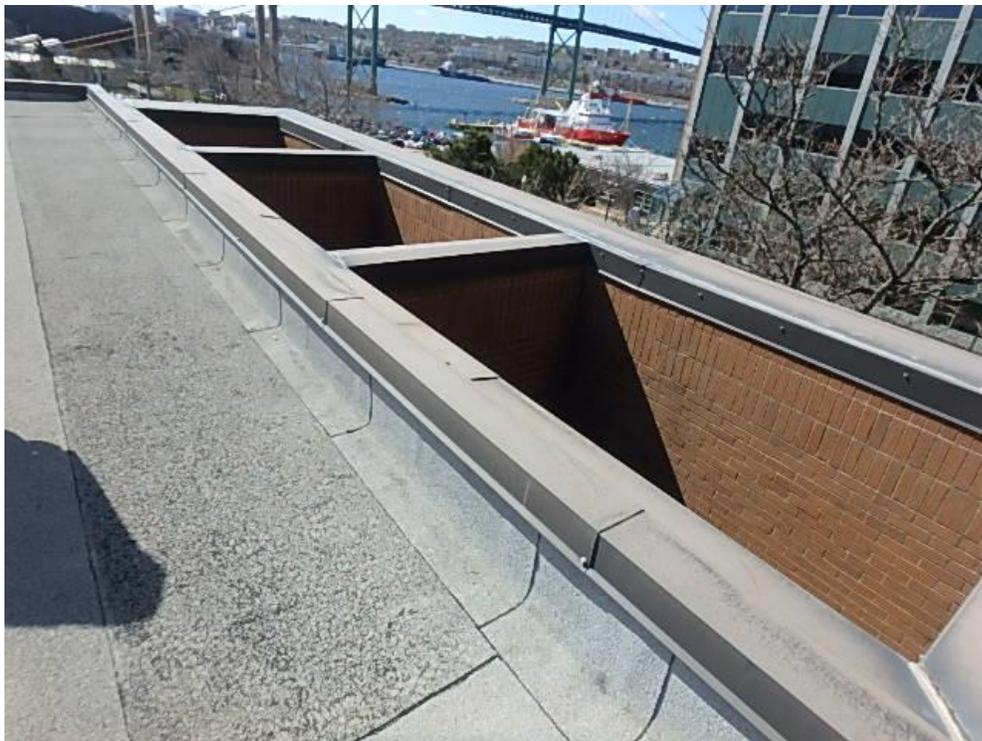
Roof Area 1.1 –.Ridging of membrane at seam.
